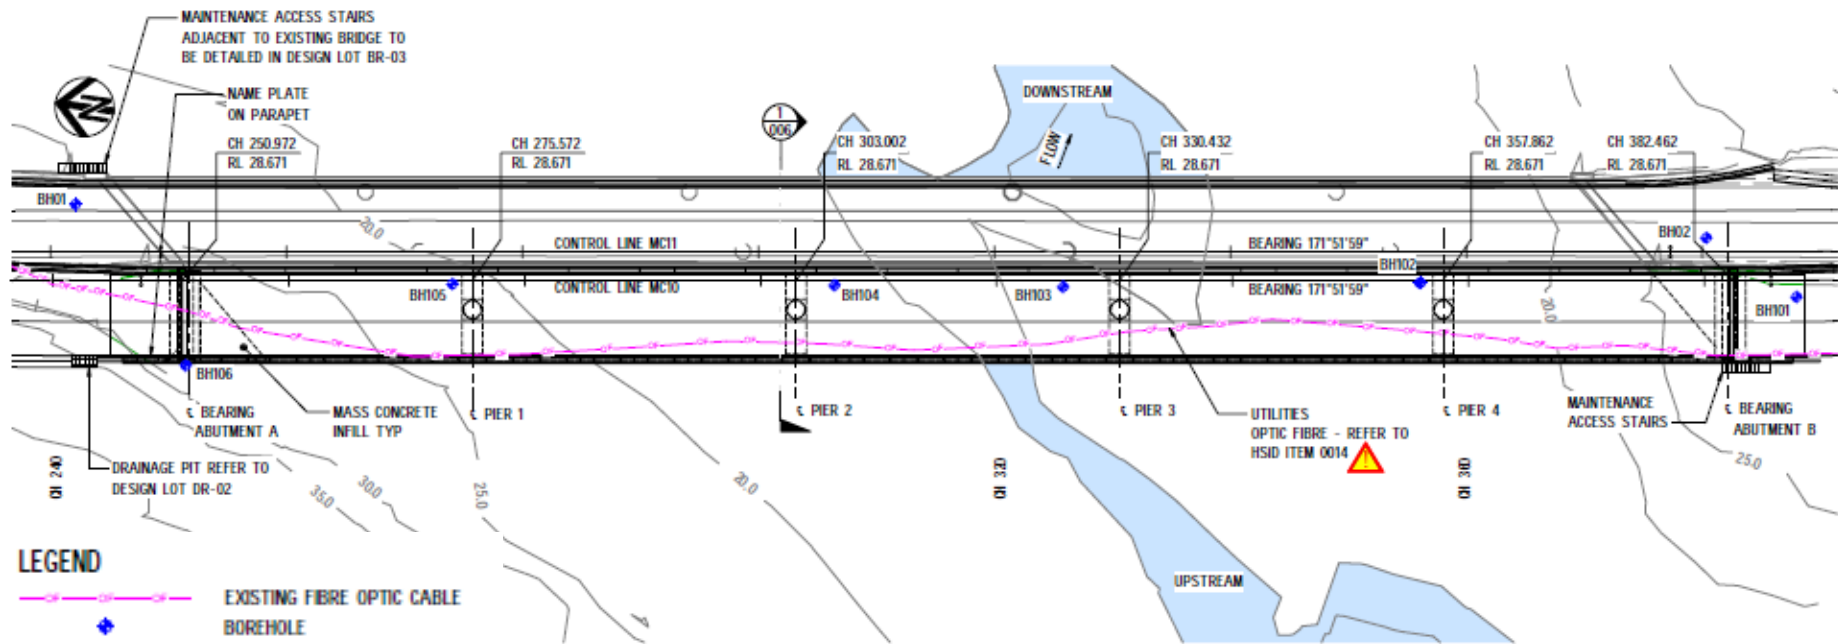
Alignment of existing fibre optic cable and bridge piers
